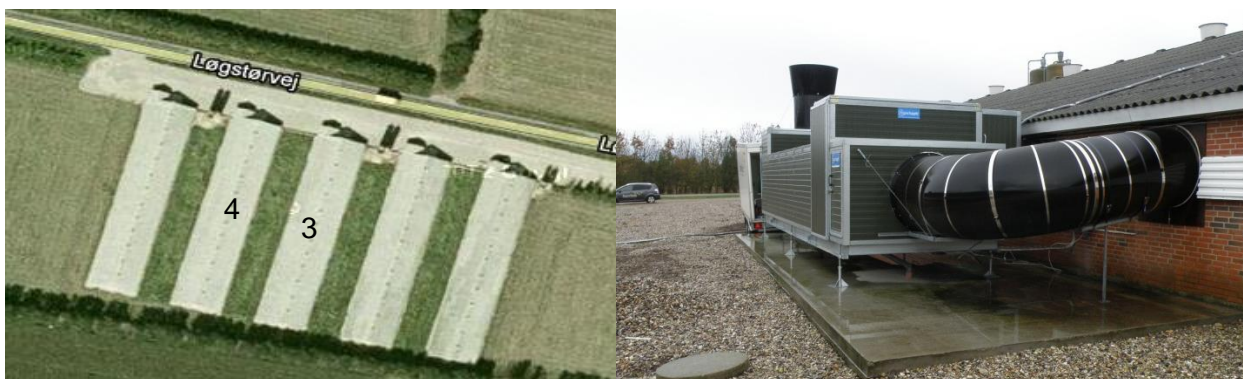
The left picture shows an aerial photo of the two test broiler houses. The house denoted 4 is the control test section, while the house denoted 3 is the case test section. The right pictures shows the Agro Clima Unit situated outside test section 3.
